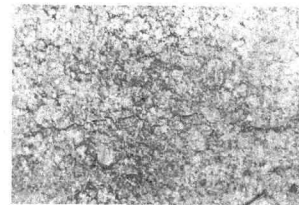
Crack occurred on the top surface of a massive concrete beam
